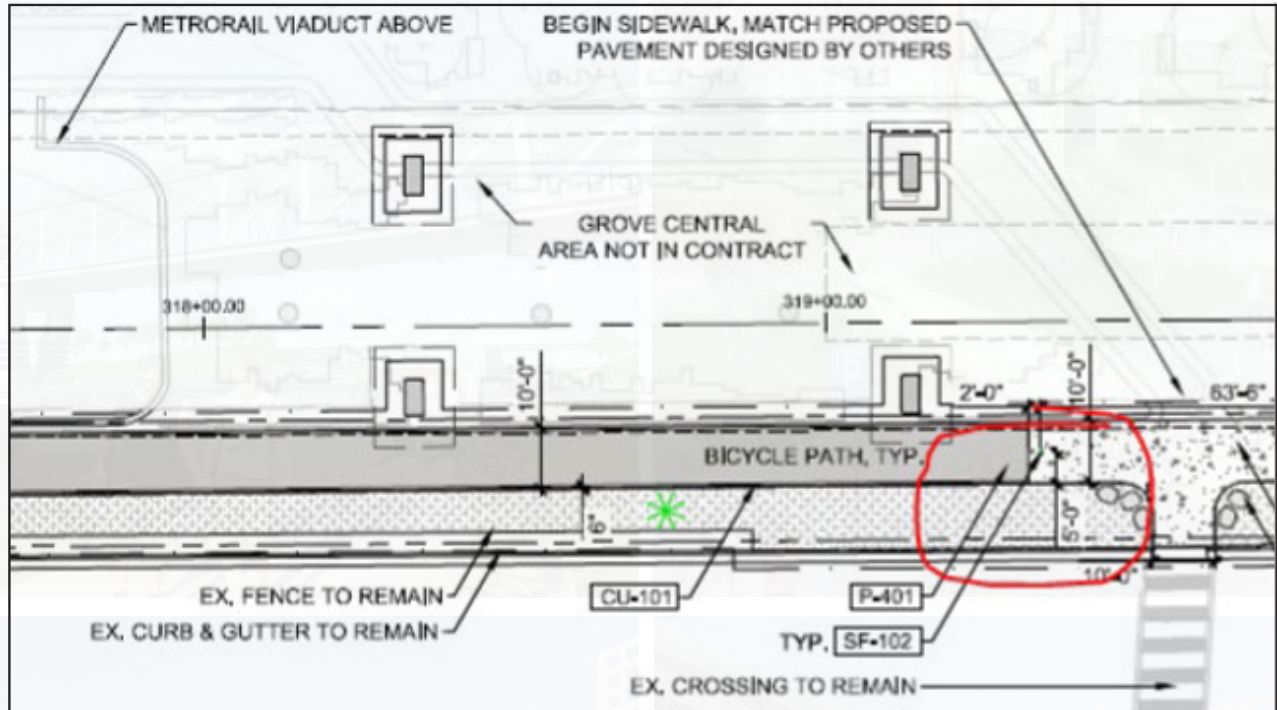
Proposed Underline Plan View at US-1 and 27th Avenue
